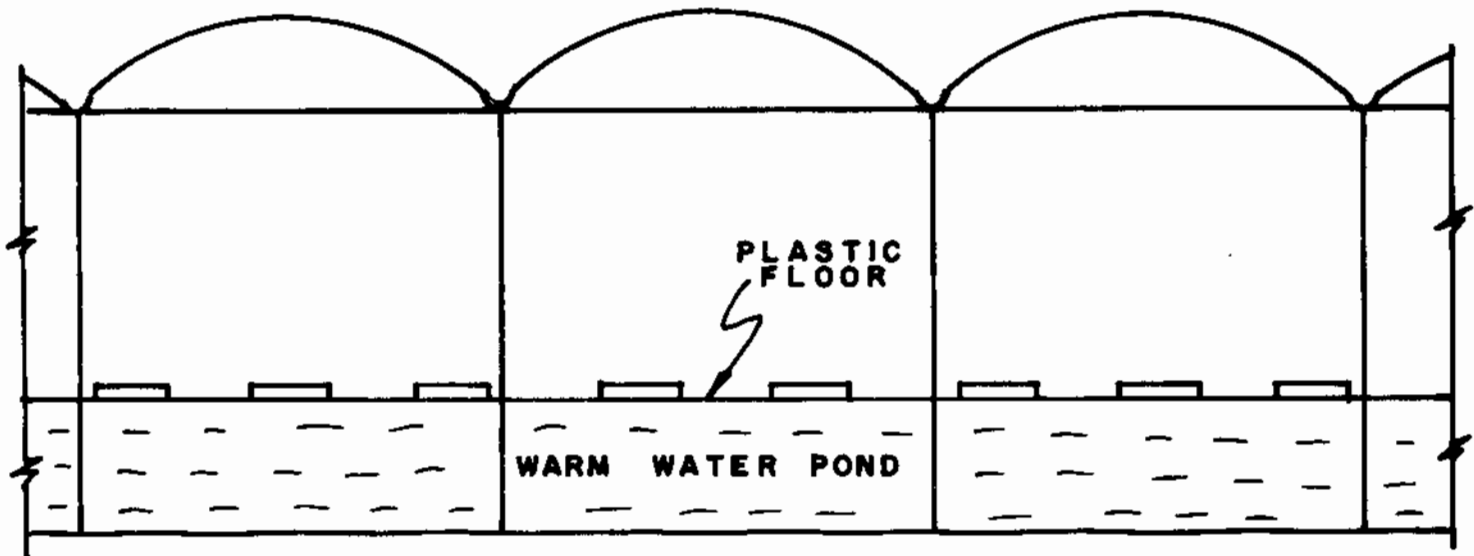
LARGE MULTISPAN GREENHOUSE HEATED BY WARM FLOOR BUILT OVER WARM POND
